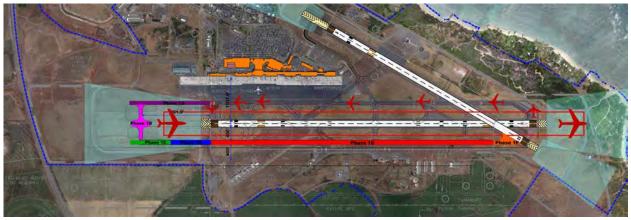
T-RWY Pavement Construction North of TXY C
